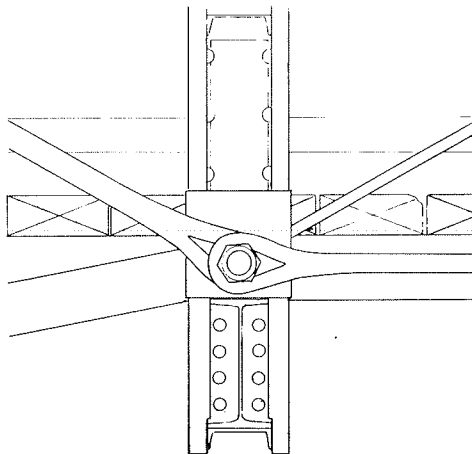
Intermediate-stage photogrammetric documentation of joint detail of pony truss bridge.
